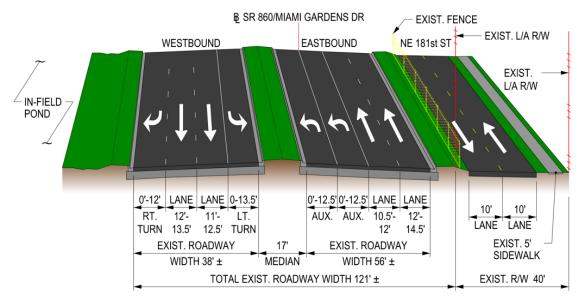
2: Existing Typical Section - SR 860/Miami Gardens Drive
